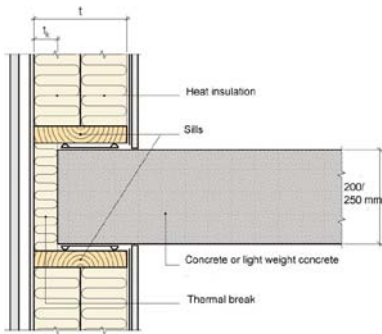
Detail of wall/floor junction, a typical point for thermal bridging
